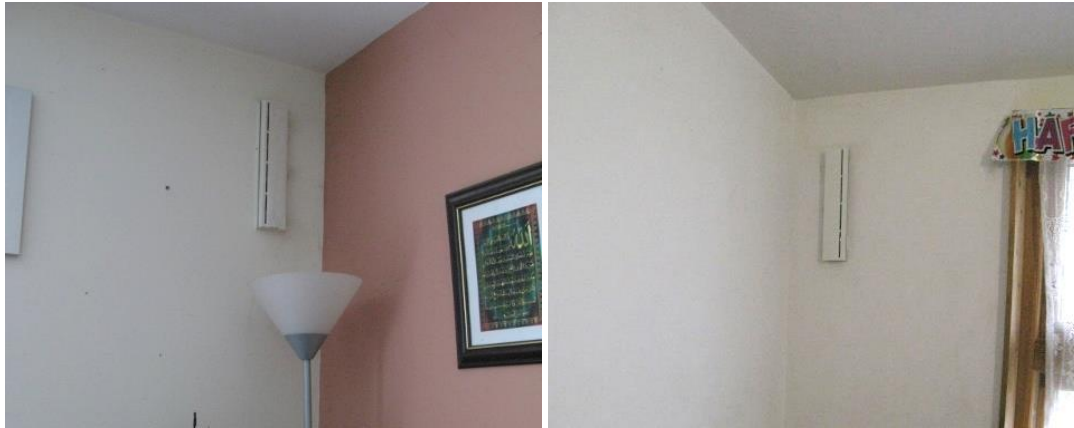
Humidity controlled wall inlet in living rooms at (Sabeen, left and Fara, right)
